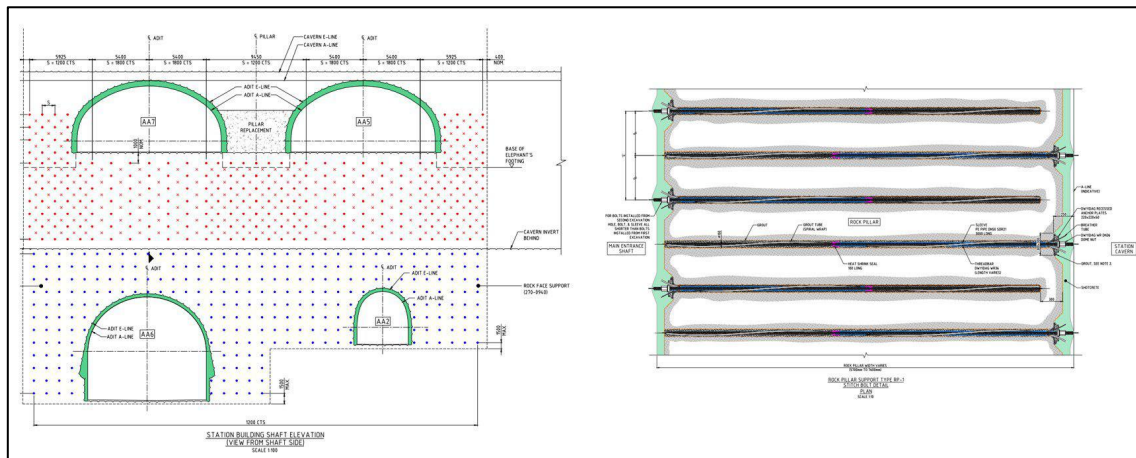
Stitch bolt ground support and concrete replacement of the pillar between the Albert Street Station cavern and the Lot 1 shaft.
